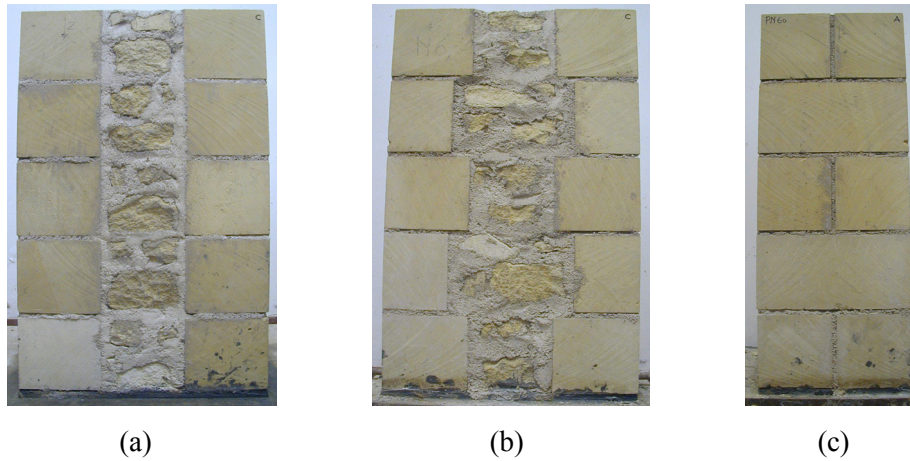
Noto* wallets: (a) front view of a specimen with straight collar joints, (b) front view of a specimen with keyed collar joints and (c) lateral view.
